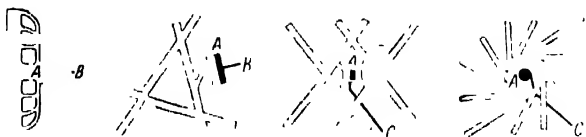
RUNWAY PATTERNS. Left to right: Single runway sited in direction of prevailing wind. A, terminal buildings; B, approach road. Runways laid out to form a triangle, with longest runway in direction of prevailing wind. A, terminal buildings; B, approach road. Four runways laid in parallel pairs. A, terminal buildings; C, tunnel from approach road. Twelve runways laid out tangentially from terminal buildings (A), which are reached by an approach road (C) passing through a tunnel under one of the runways.
